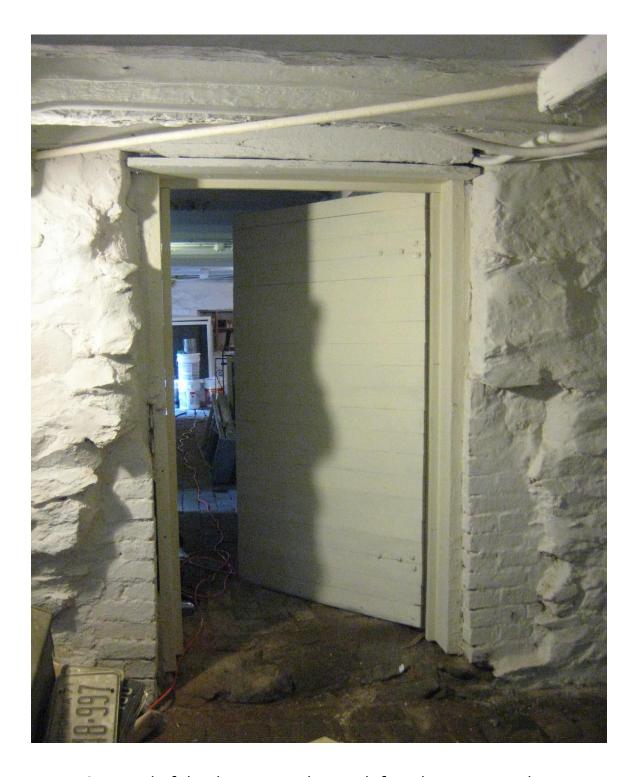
Detail of the doorway in the south foundation. Note the relatively irregular character of the stonework and the brick infill on either side of the doorway.
